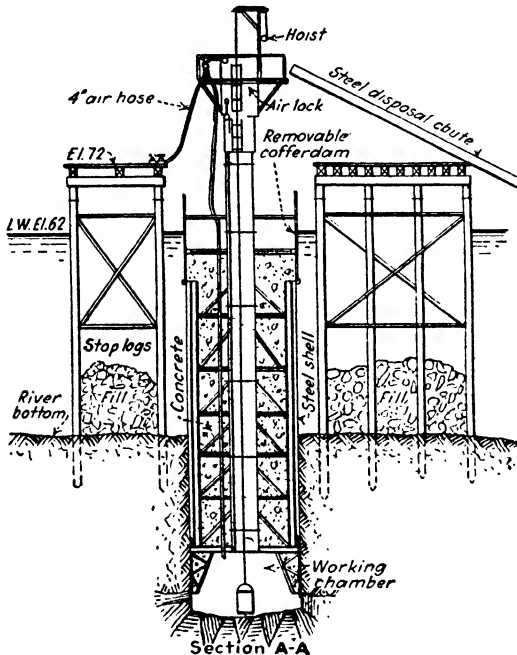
Sinking All-steel Caisson of the Caughnawaga Bridge over the St. Lawrence River.
